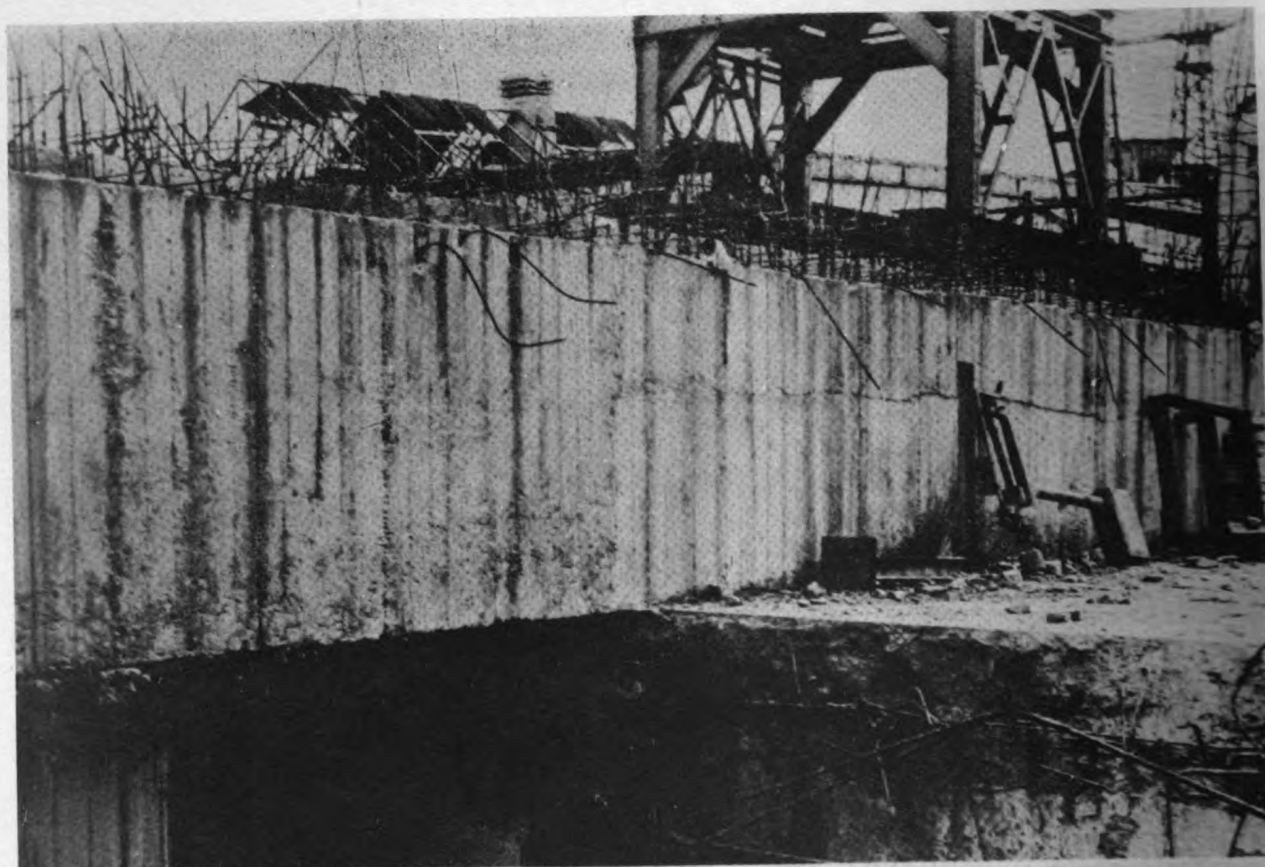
Close-up of 8 ft. thick reinforced concrete slabs beneath damaged Bldg. R.
